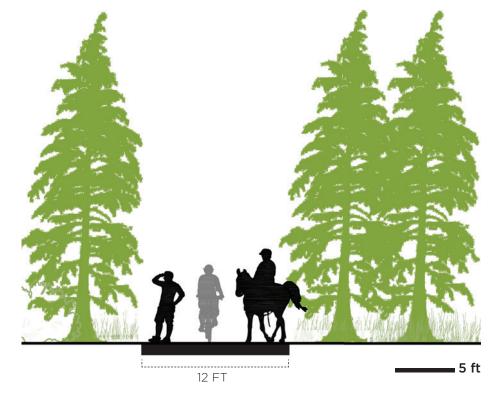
A Trail Section 1: Multi-Use Trail
